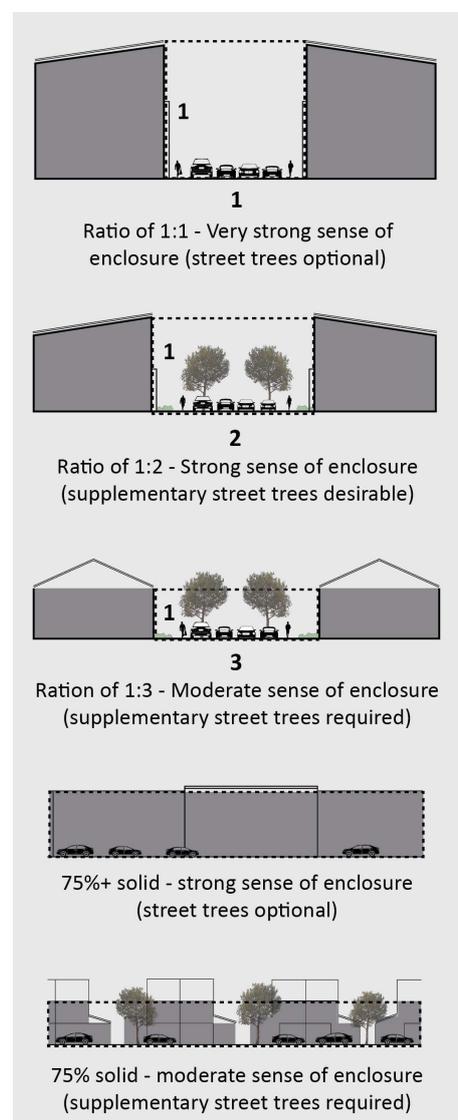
Building Height to Street Width Ratio (DMURS (2019), as adapted)
